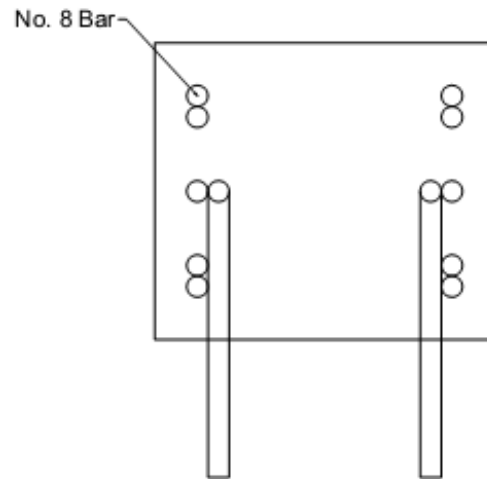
Longitudinal column reinforcement-10 No. 8 bars. Transverse reinforcement not shown. Not included in current analysis.
